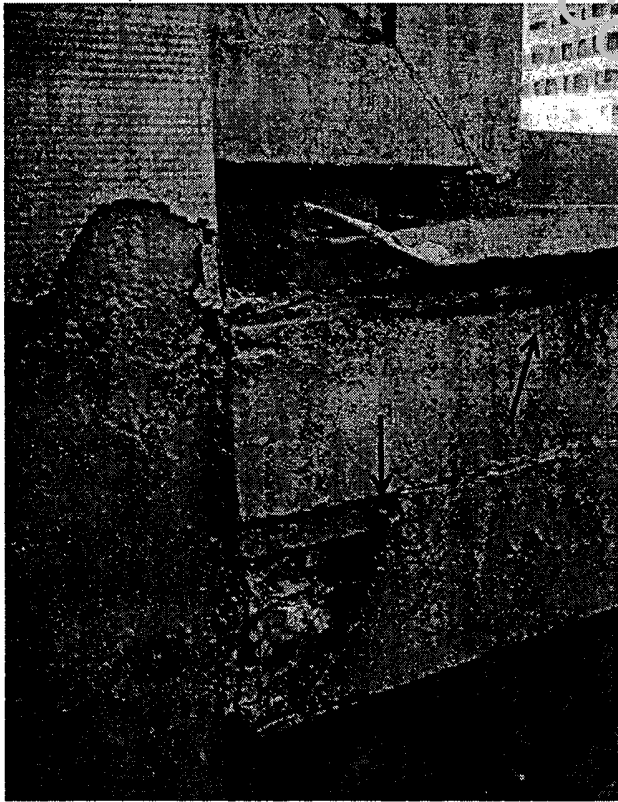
Transition between 6th floor sheet metal and cast iron at 5th floor. Sheet metal sill laps over top edge of cast iron. Same area as shown in figure 12. Note that top section of cast iron laps behind bottom section. Arrow indicates location of fasteners. In general fasteners were found to be significantly corroded.
